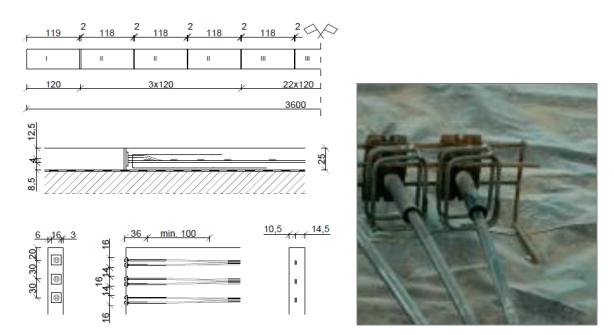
Division of prestressed slab into sections, acc. to load types I, II and III, and detail of connecting prestressed slabs with a jacking gap, and a view of preliminary stabilised tendon terminals, dimensions in cm, descriptions in the text [own study, photo by A. Seruga]
